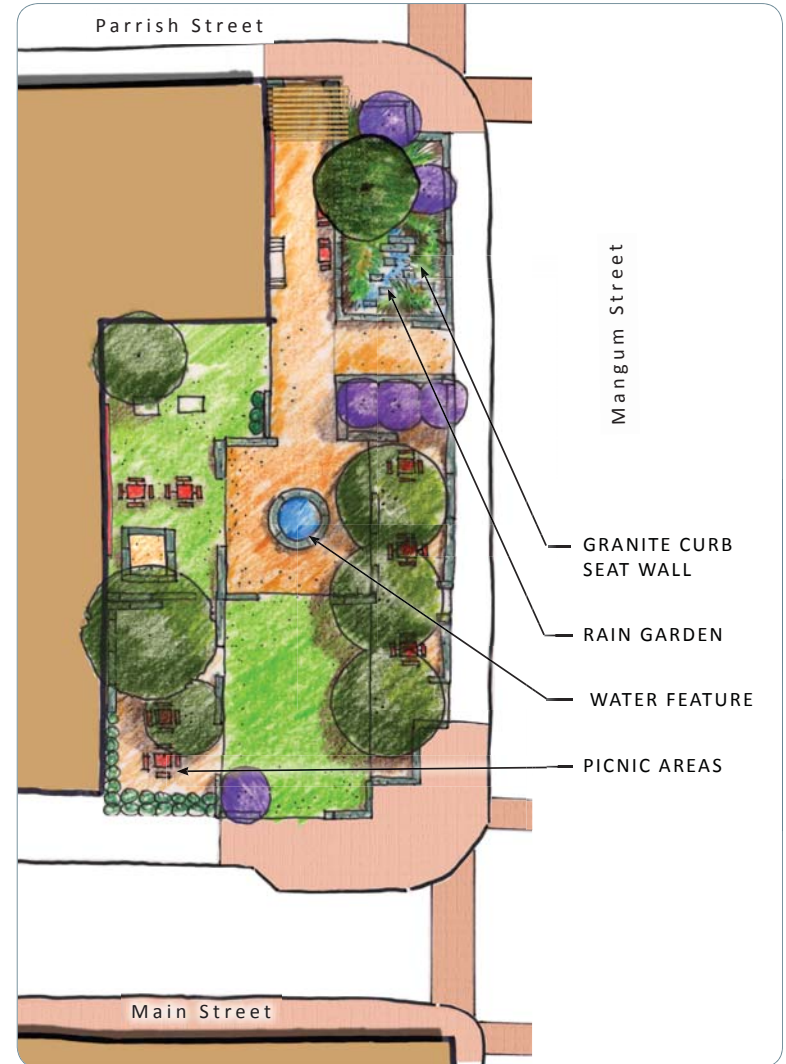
Conceptual Redesign of Park at 102 West Main Street.
